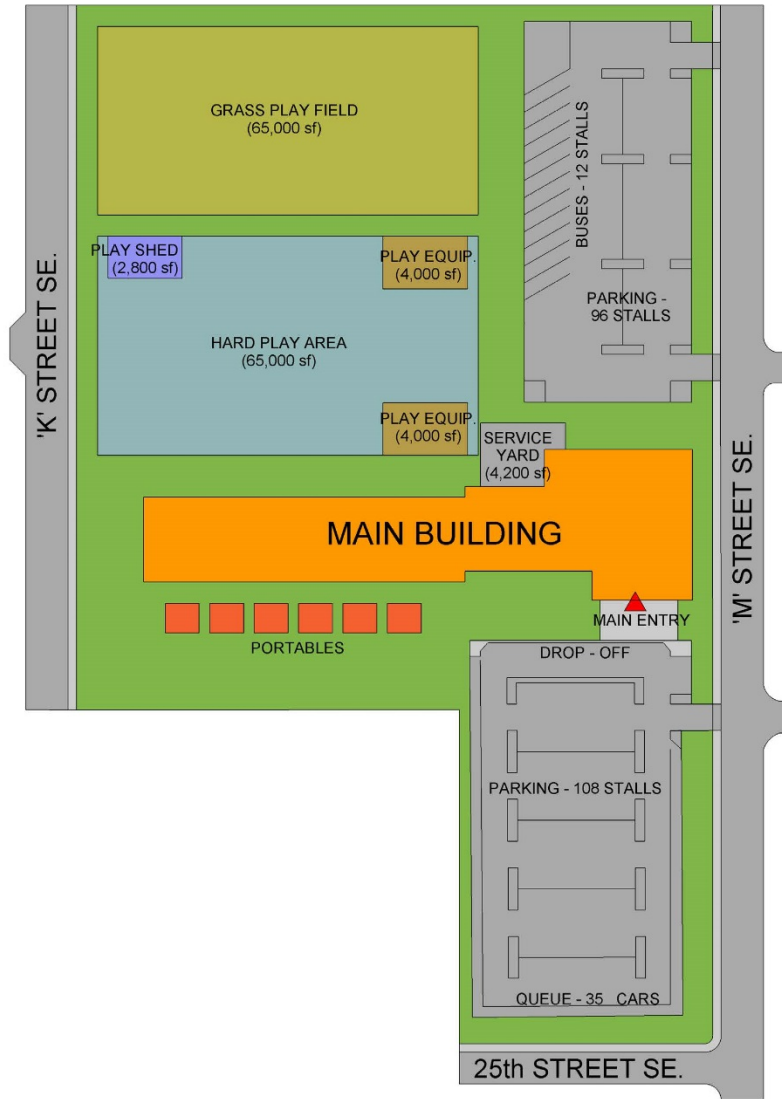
Pioneer Elementary School Concept Site Plan
